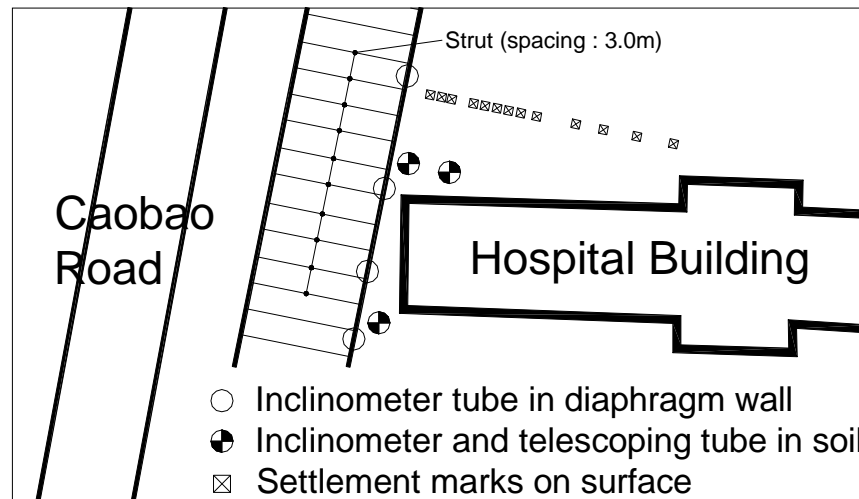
Plan view of the Caobao subway station excavation (Modified from Shao and Macari 2008)
